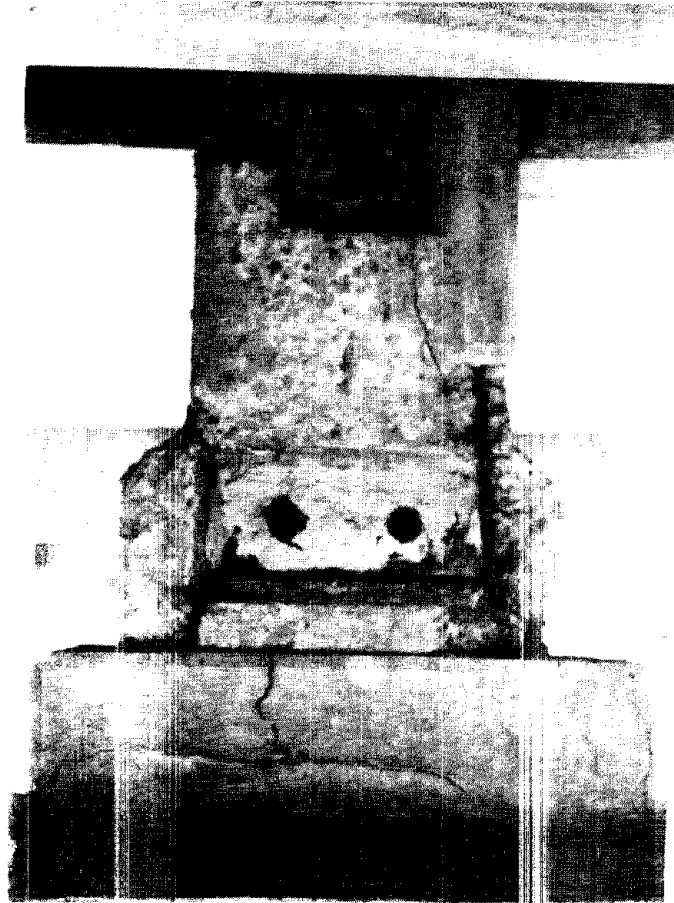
Spalling of the mortar cover over anchor steel plates.
